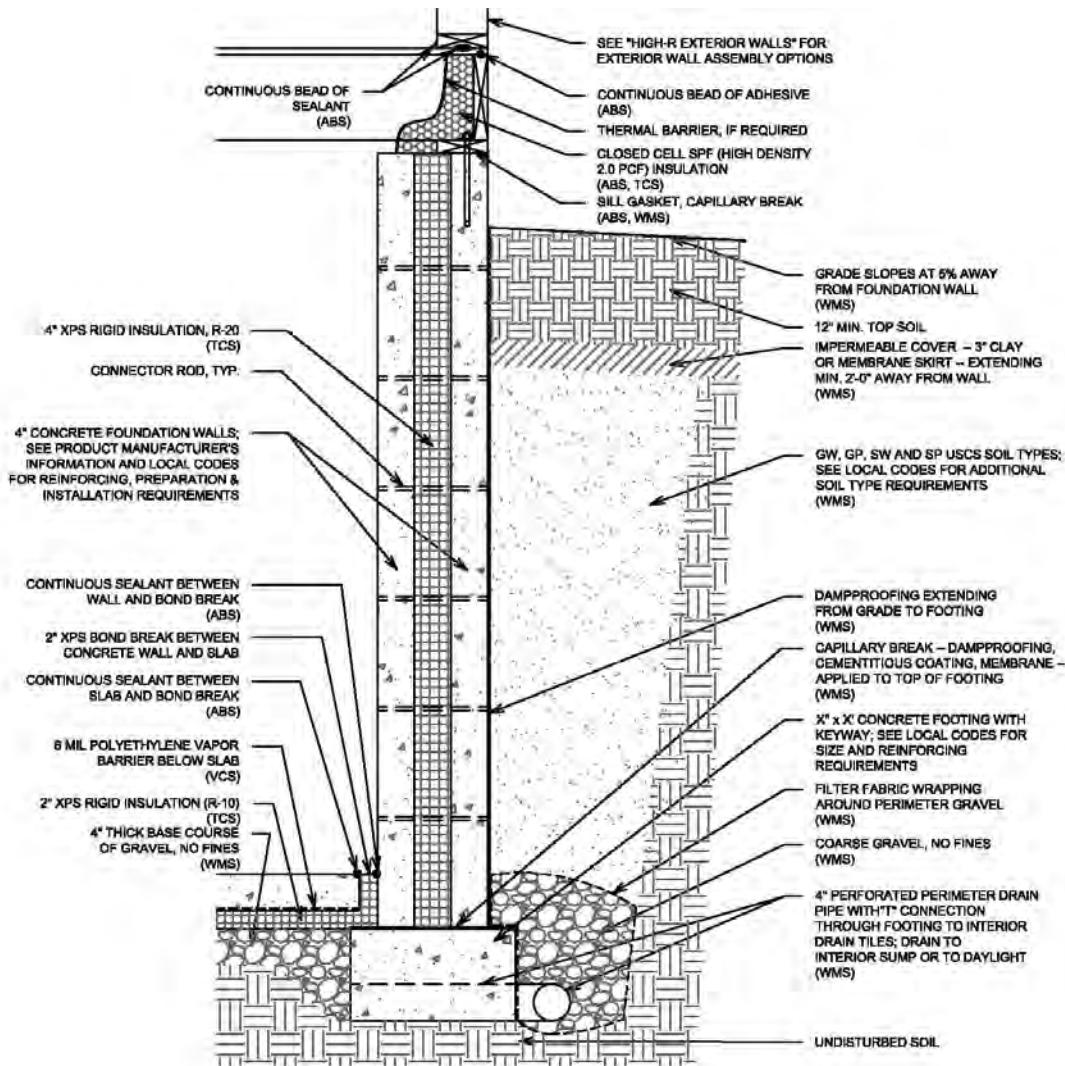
Case 12 Detailed Drawing – Recommended Foundation Wall System
